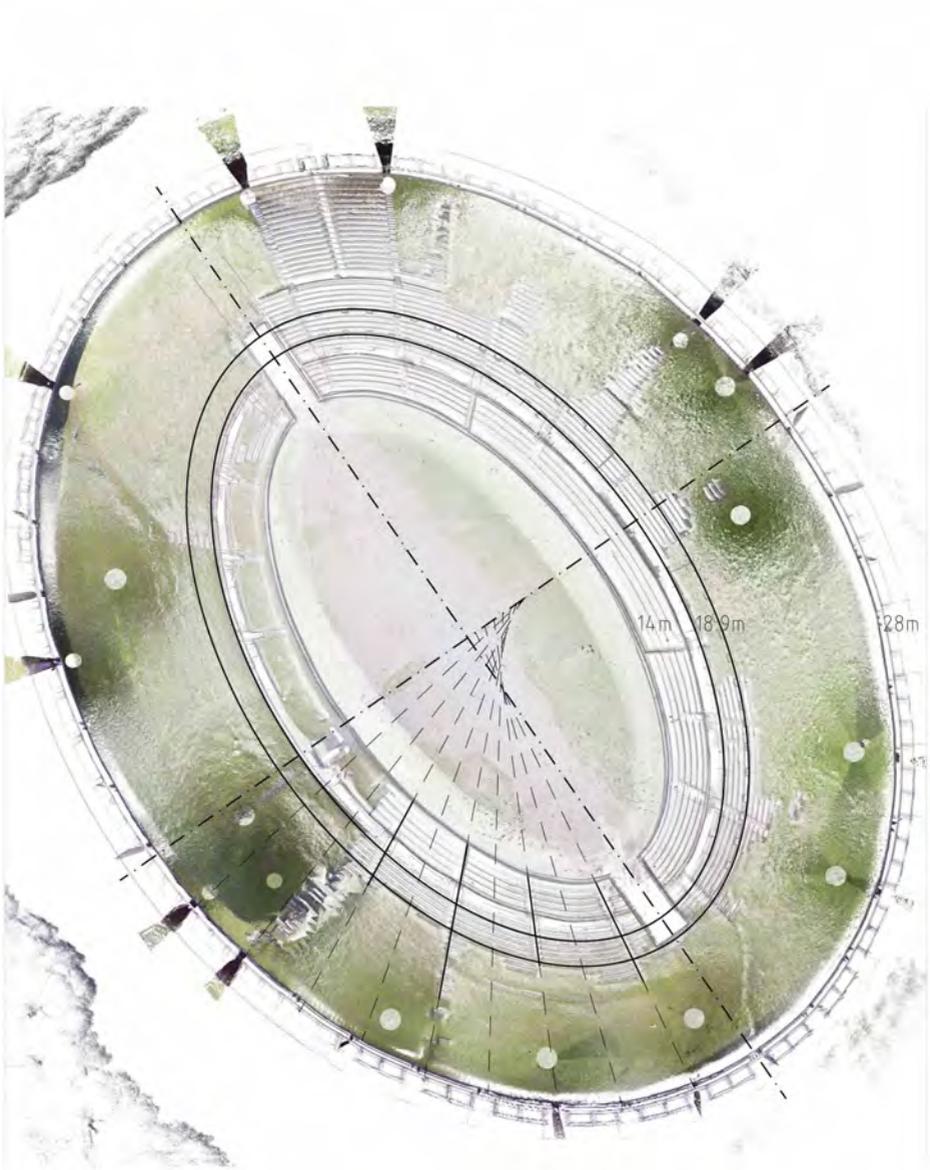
Amphitheatre in Pompeii. The axes of the stairs' flights. Determination on the horizontal section, representation on ortho-image from model, and drawing of the geometric rule.
